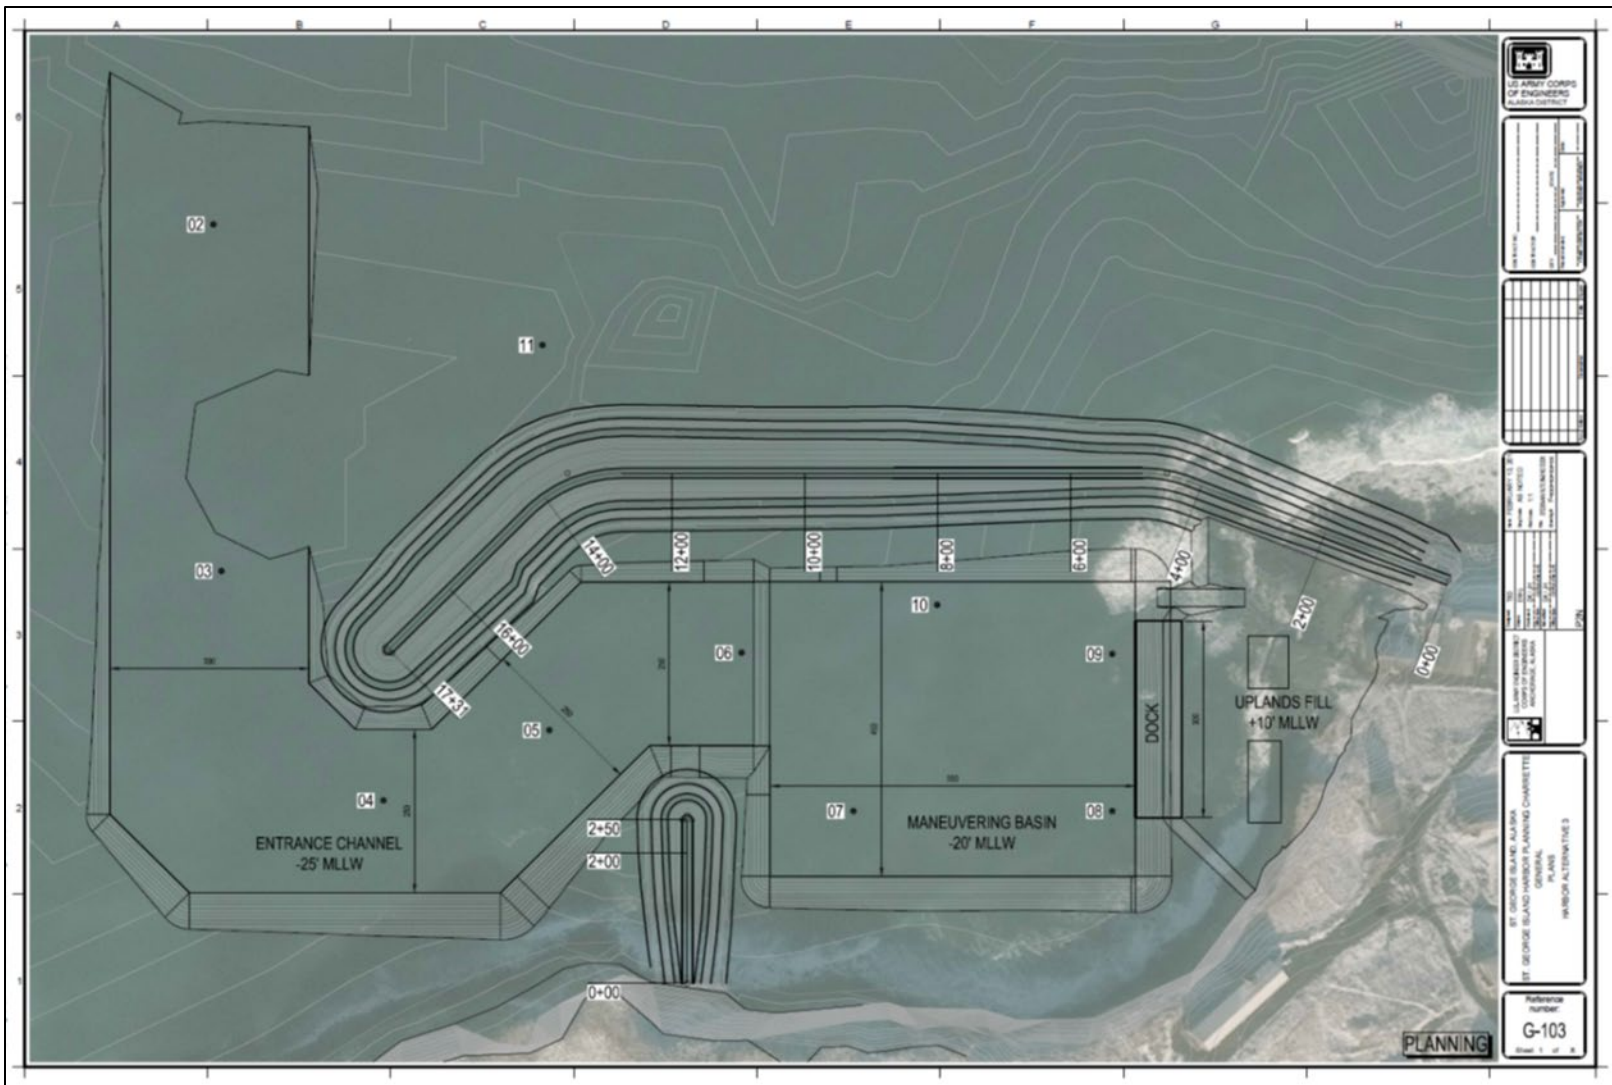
Saint George Navigation Improvements Recommended Plan Concept Drawing
